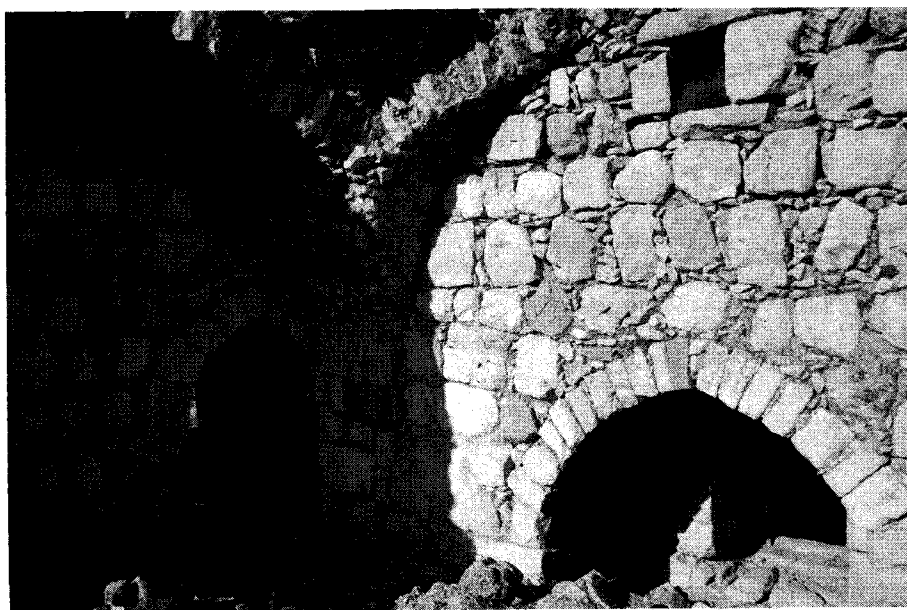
Bourzey: interior of upper floor of donjon/entrance tower showing crudely built arches and springings for groin vault.
